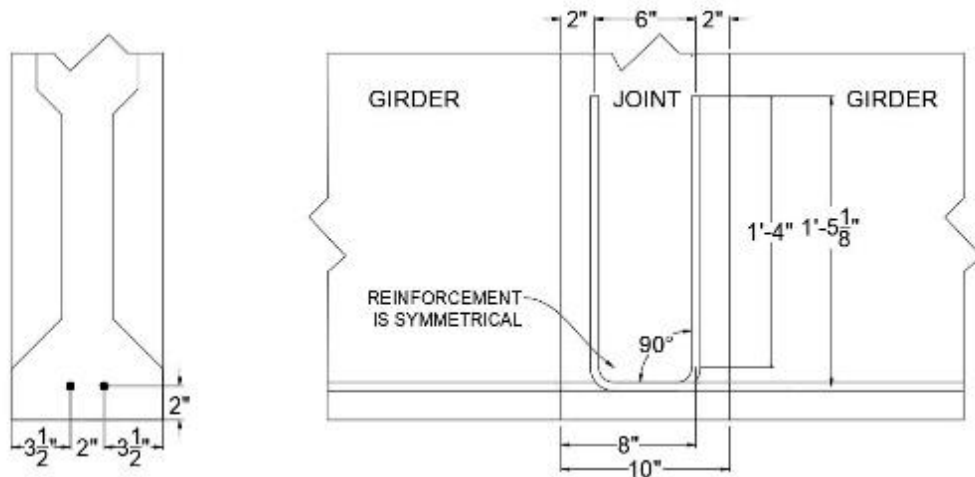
Newly constructed continuity joint prestressing strands detail for positive moment
